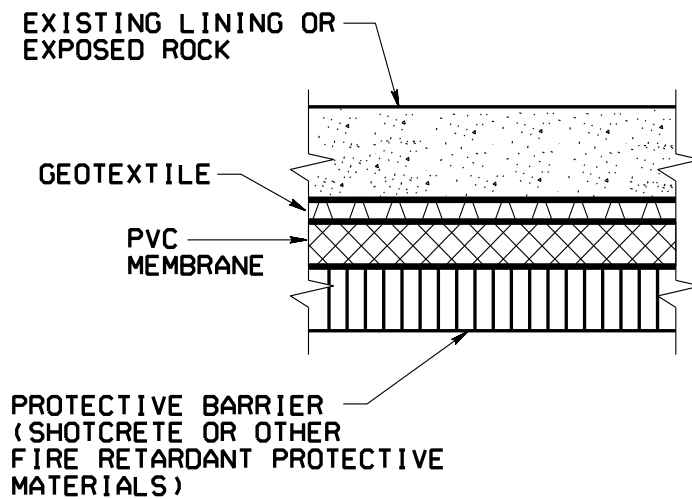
Section of membrane waterproofing system (FHWA, 2005).
